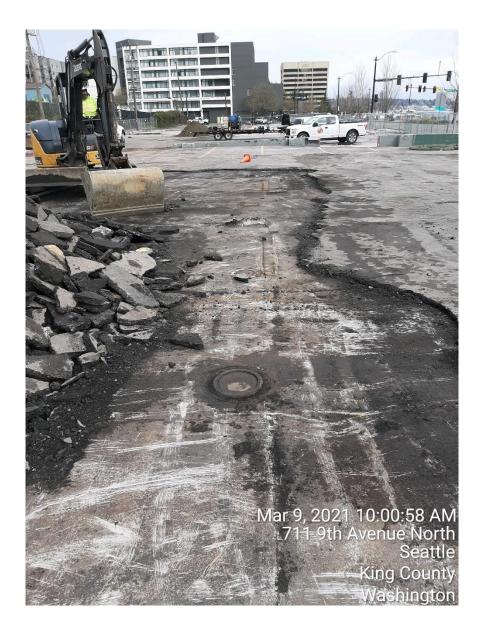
Below left. Hoist-1 (background) and Hoist-2 (foreground) from the north before concrete demolition.
